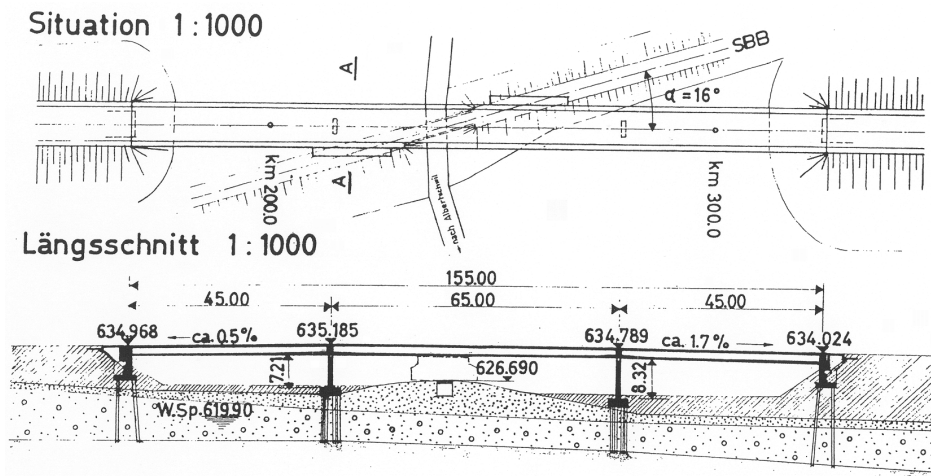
Plan view and elevation of bridge over railway on west-bypass Gossau (SG)
